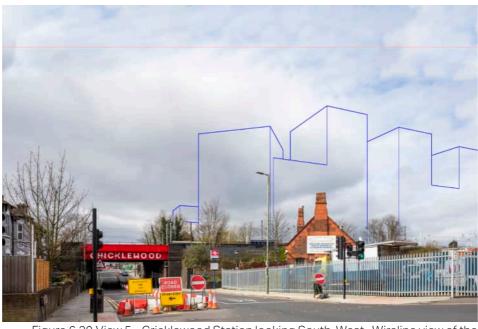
View 5 - Cricklewood Station looking South-West. Wireline view of the Application Scheme.
